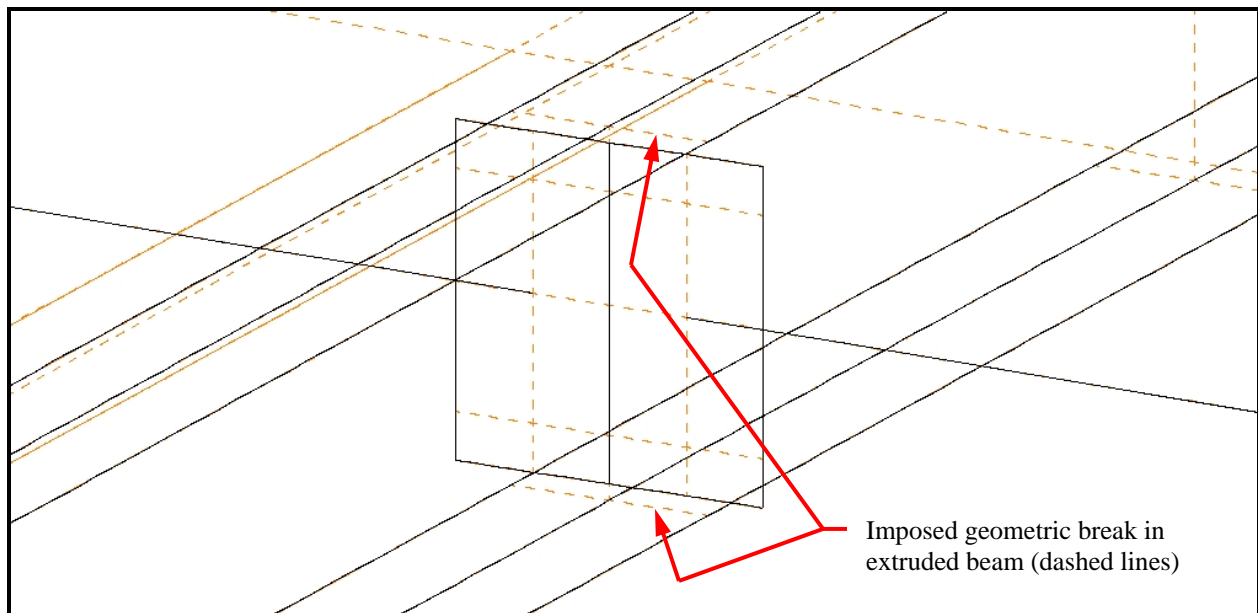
Geometry showing break in beam at cross-frame connection.
